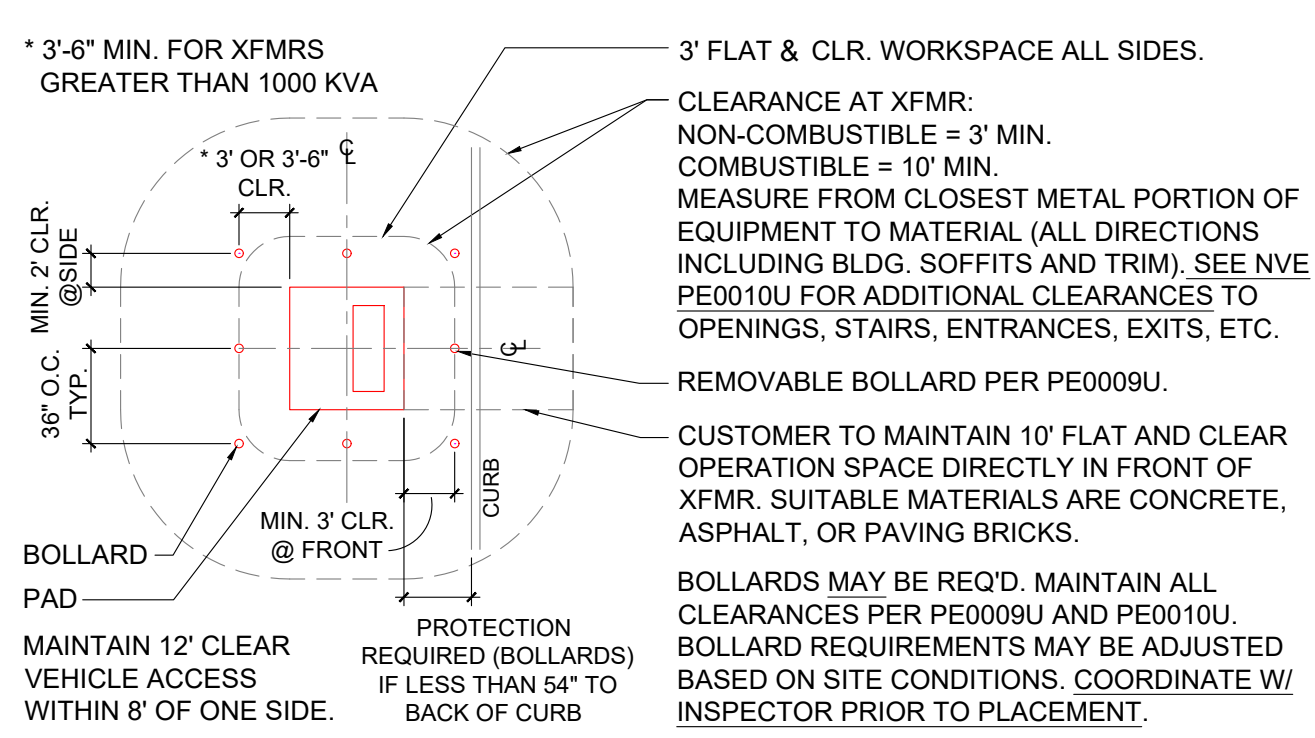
EXHIBIT "A" APPLICANT INSTALLED CONDUIT ELECTRIC DESIGN
